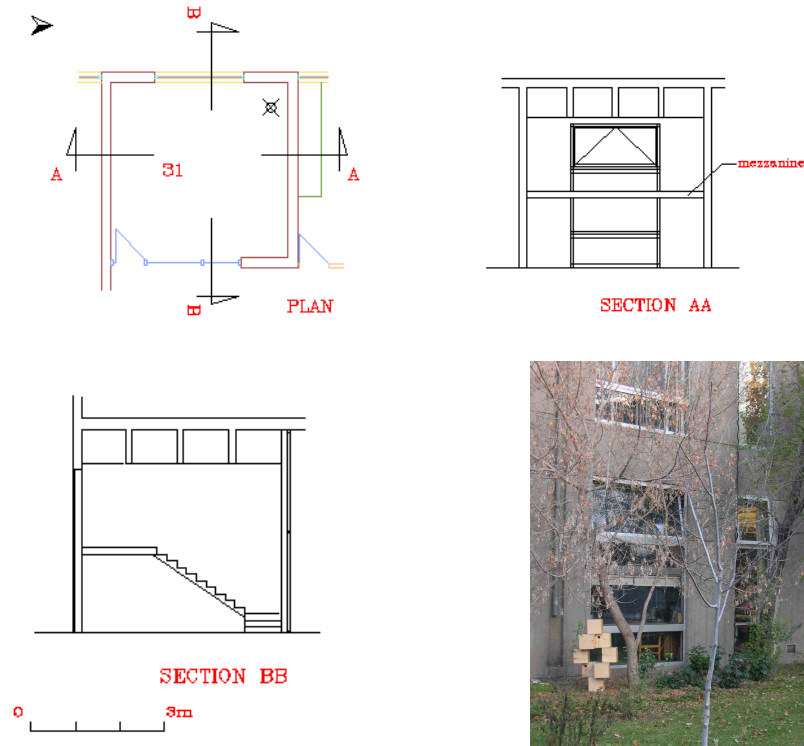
Floor plan, section AA, section BB and exterior view of Room 31. (photo by the author.)
